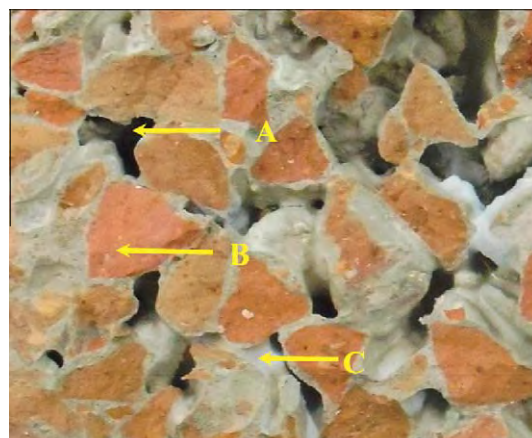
Fracture surface of PGC containing RB; (A) void; (B) fractured RB; and (C) geopolymer paste.
